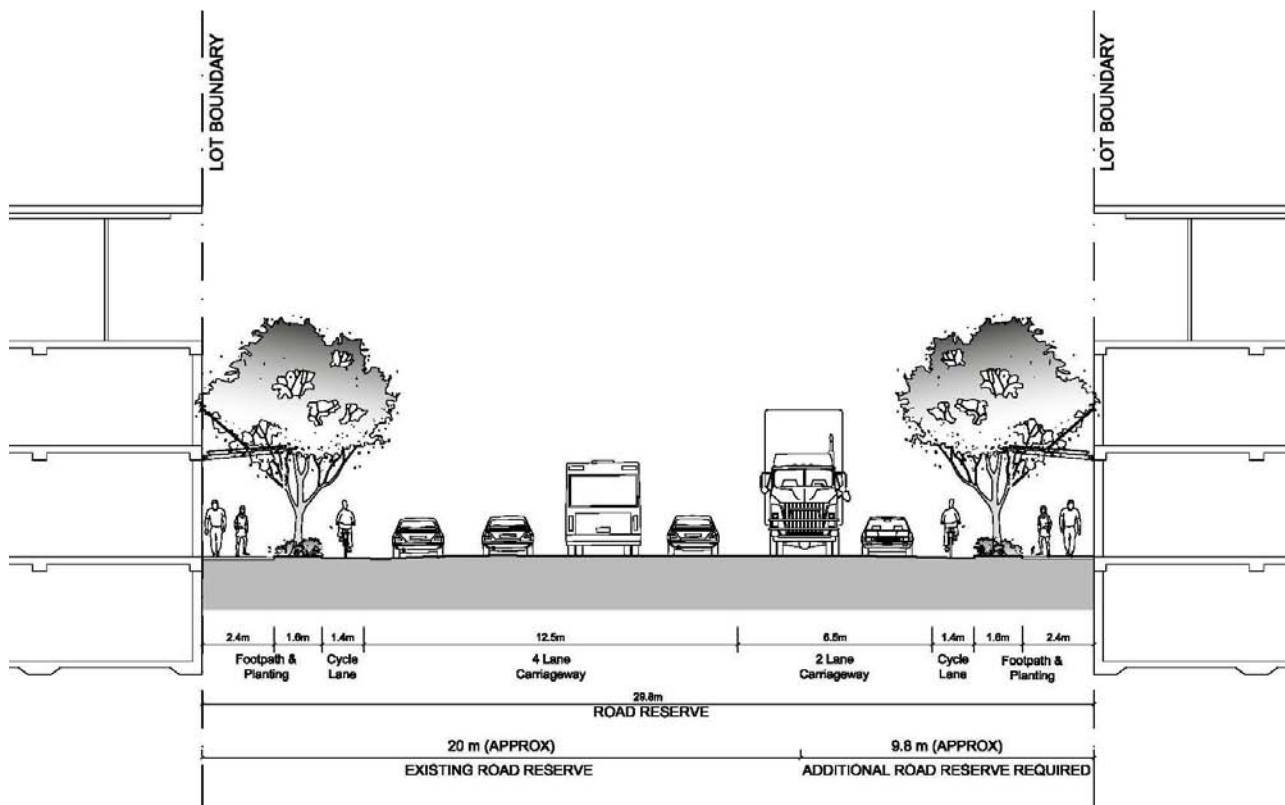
Edmondson Avenue Austral Town Centre Section A
